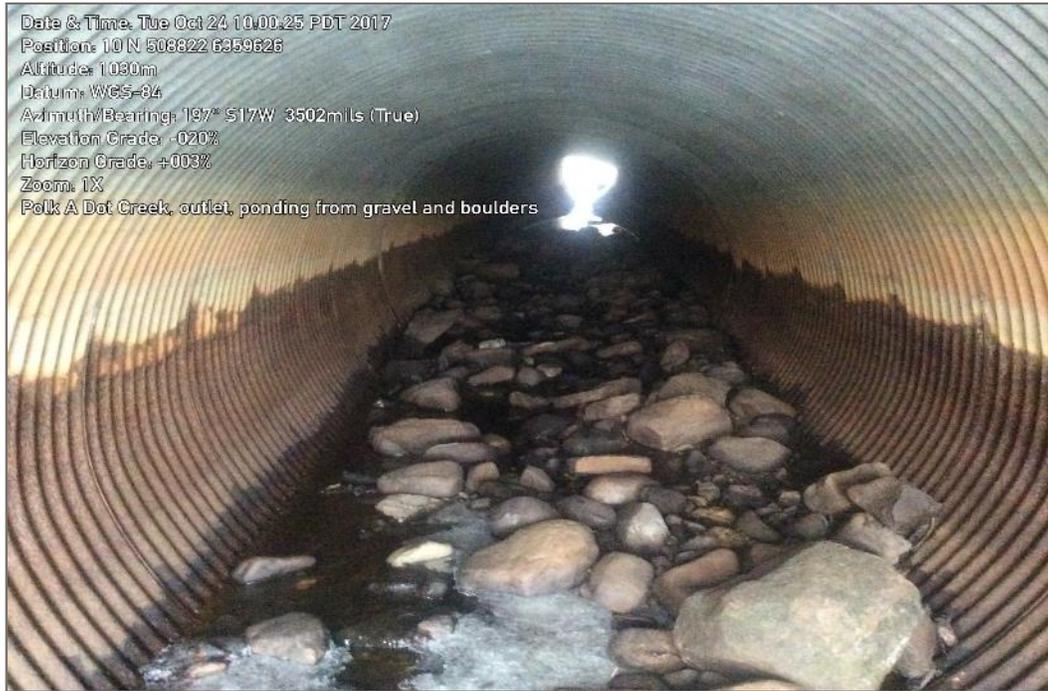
View inside Polk-A-Dot Creek culvert from outlet. Culvert embedded with cobble and gravels amongst the baffles (several broken). Inlet of culvert no longer embedded. Replacement culvert will include natural stream bed materials similar to this.
